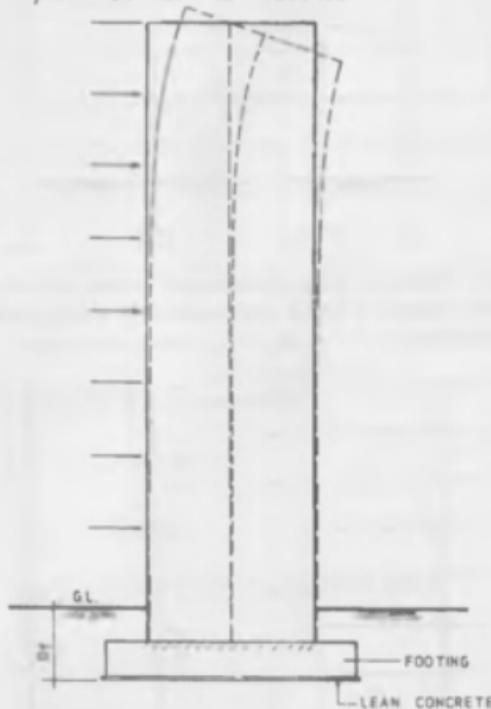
Behaviour of shear walls and frames under horizontal loads. Cantilever beam action of shear wall under horizontal loads (bending mode of deflected shape).
